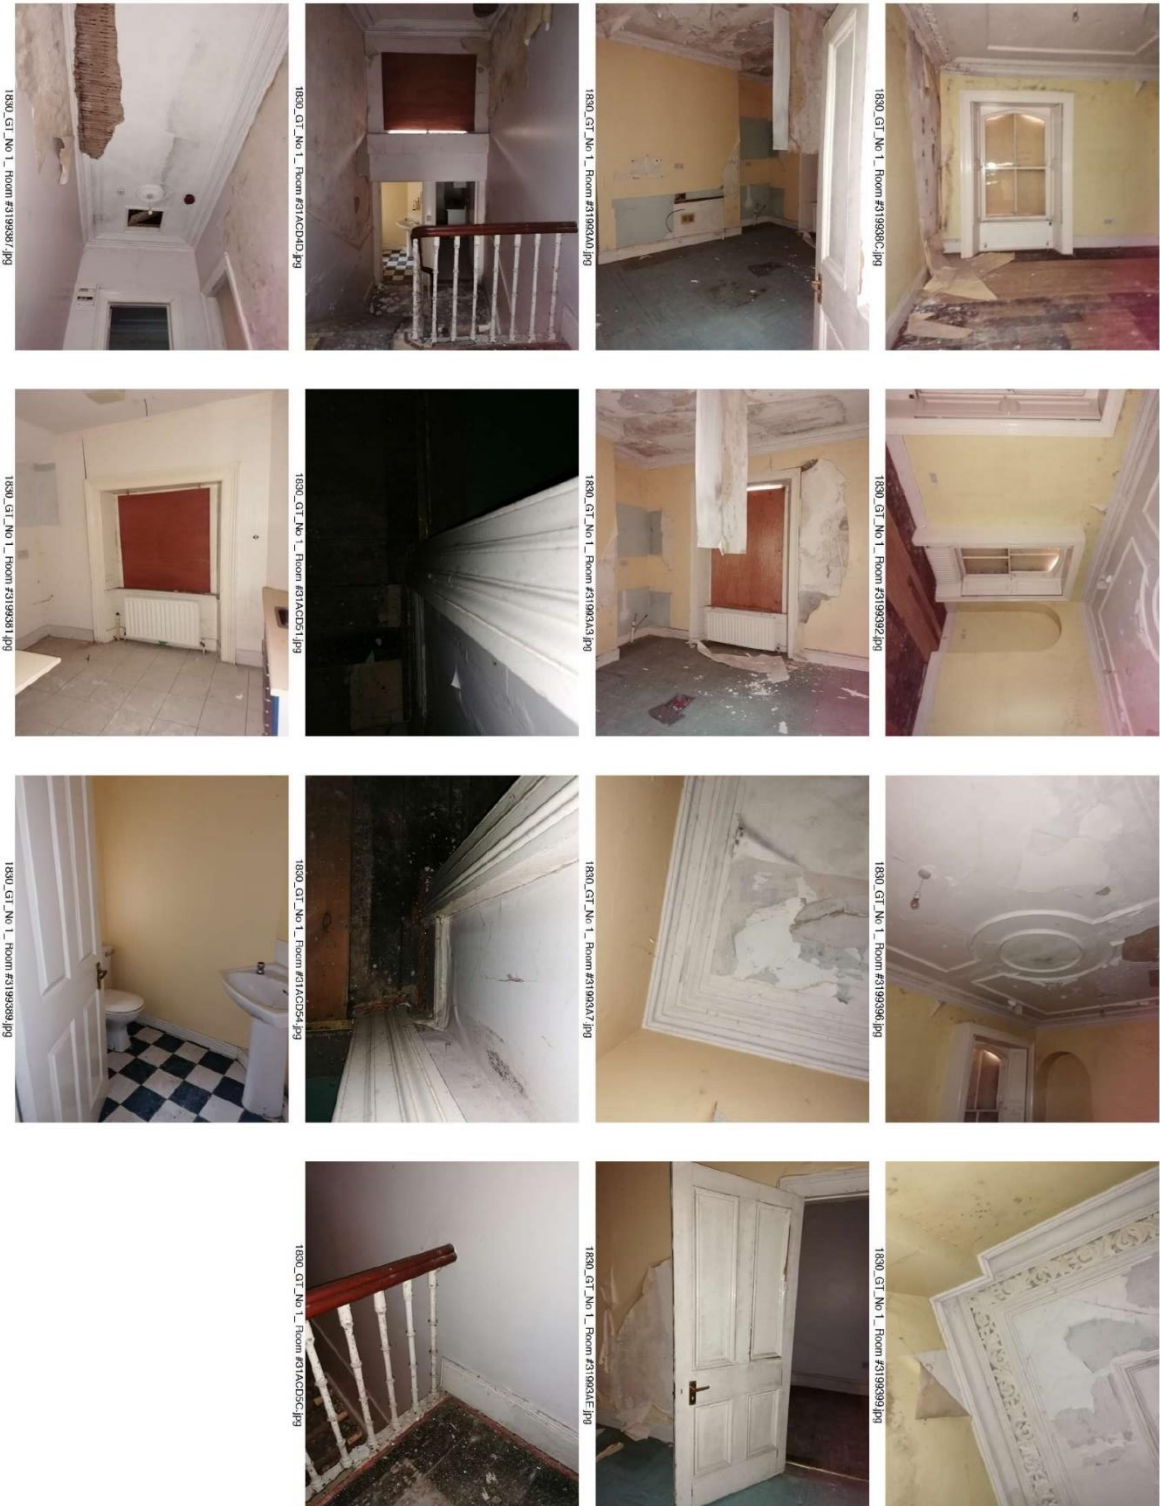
B.6. No.1 Glenville Terrace, First Floor Record Photographs
